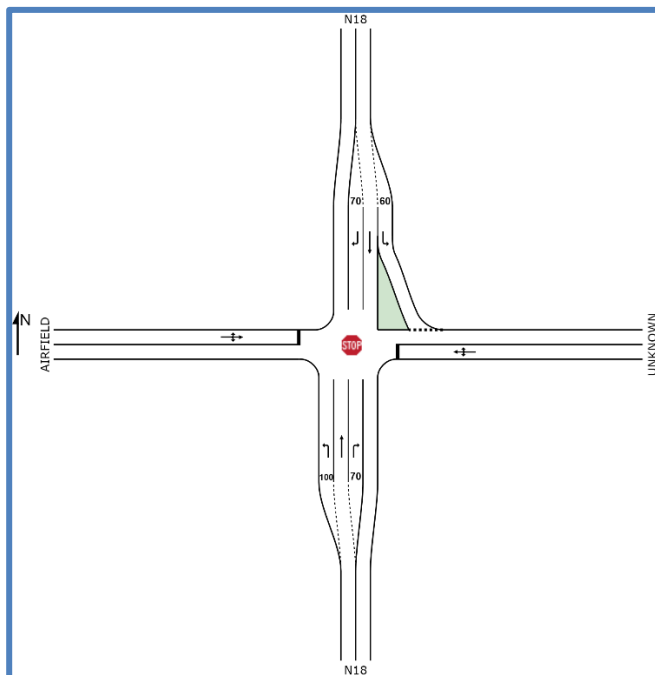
Existing Layout of N18, Airstrip Road and Liquid Silver Street
